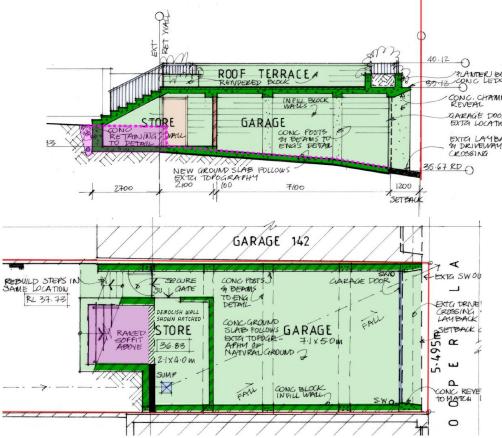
Section and Plan View of the proposed garage and roof terrace above. Highlighted in magenta is the approximate extent of the proposed excavations. Base drawing: Kenström Design Pty Ltd
